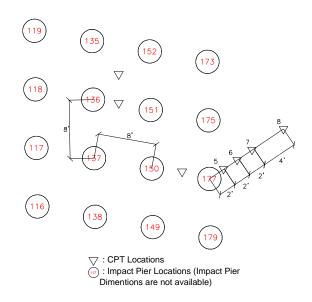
Manalapan, NJ: Plan layout of the CPT locations
